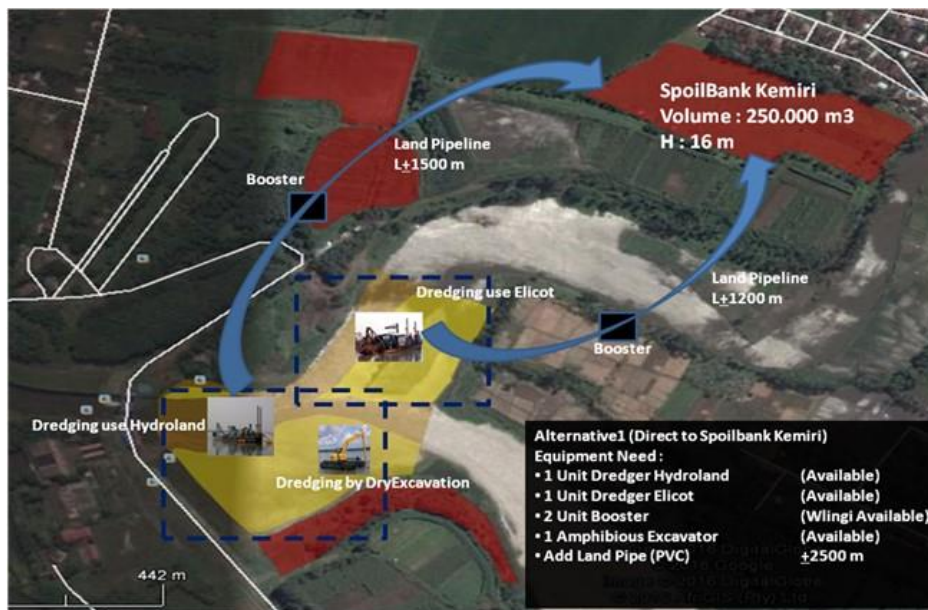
General Plan Dredging Work Combine with Dry Wet Excavation
